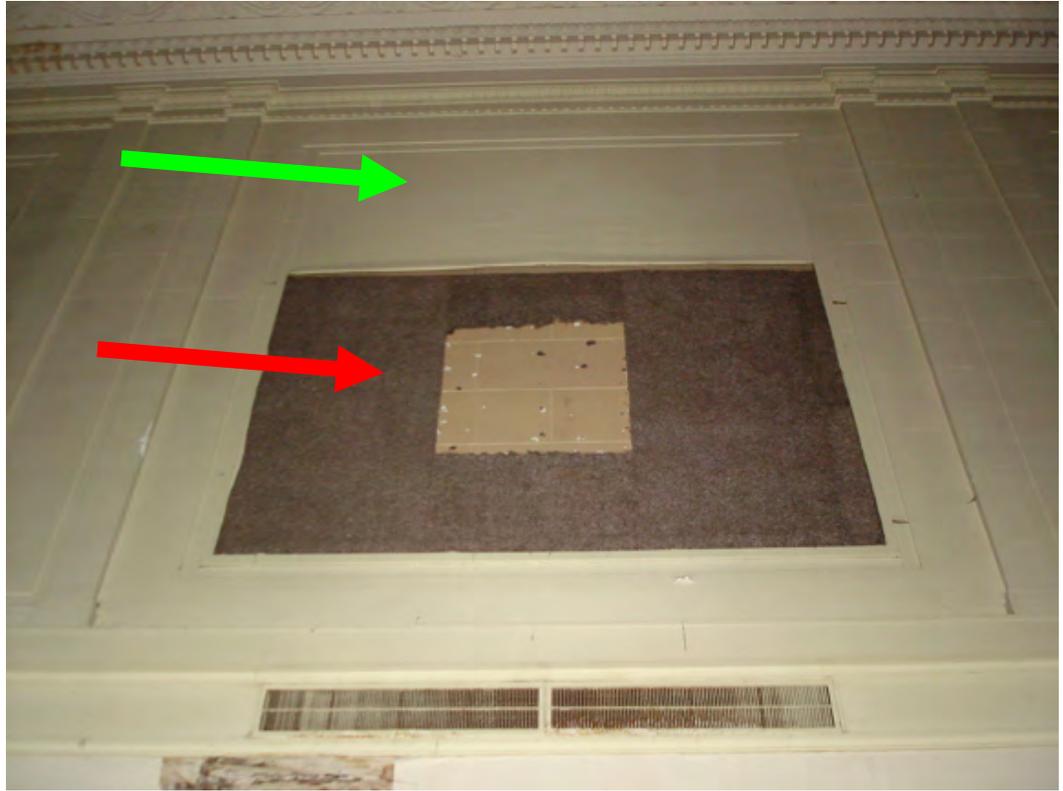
Typical recessed panel of Exchange Hall walls. Note the original ashlar block pattern (center), surrounded by shag carpet (red arrow) and painted canvas (green arrow).
